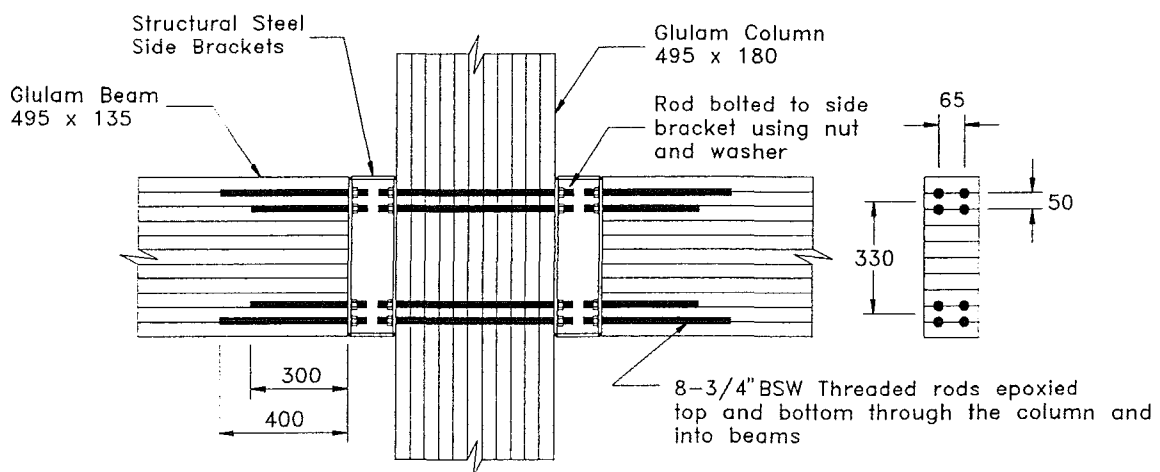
Arrangement of steel side brackets and bars for Units 6 & 7
